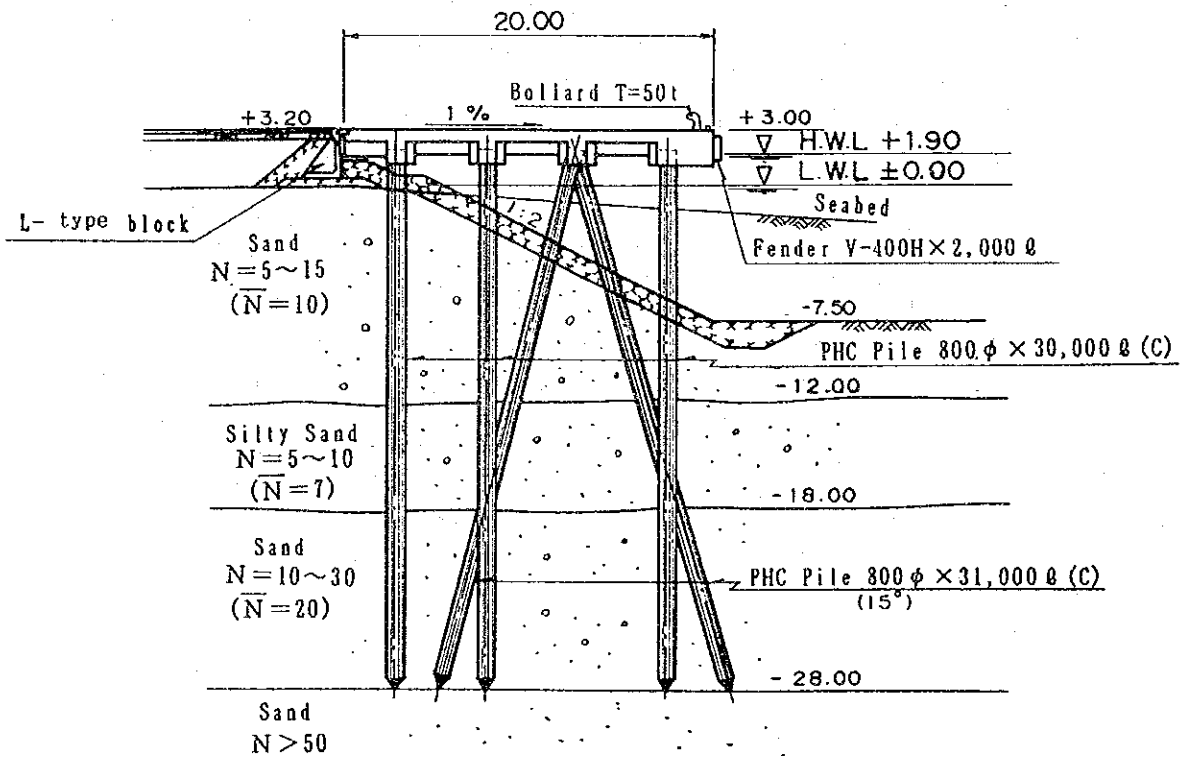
Standard Cross Section of Bulk Cement Berth
